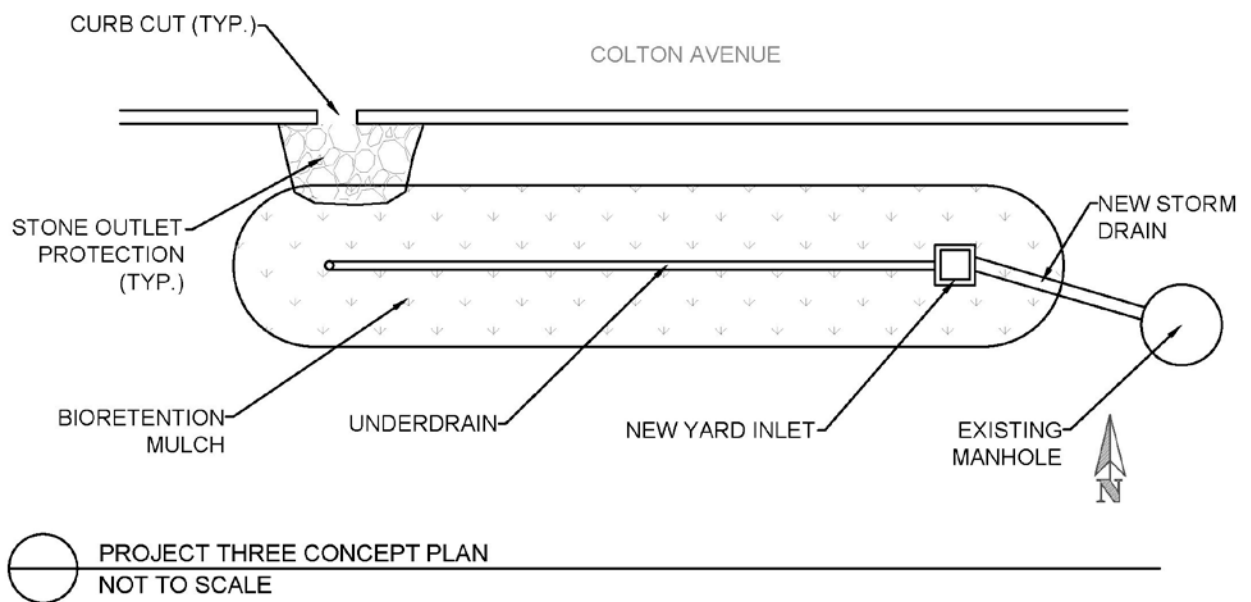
LID Pilot Project Site 3 Concept Plan
